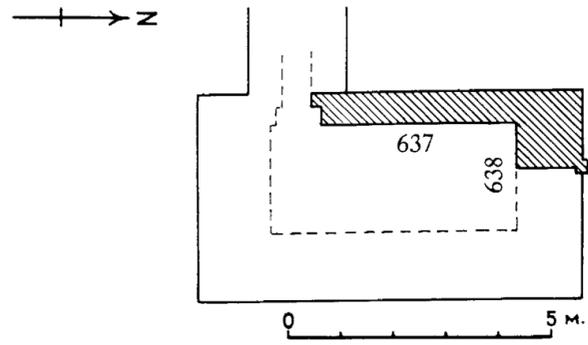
FOURTH-FLOOR PLAN, NORTH TOWER
